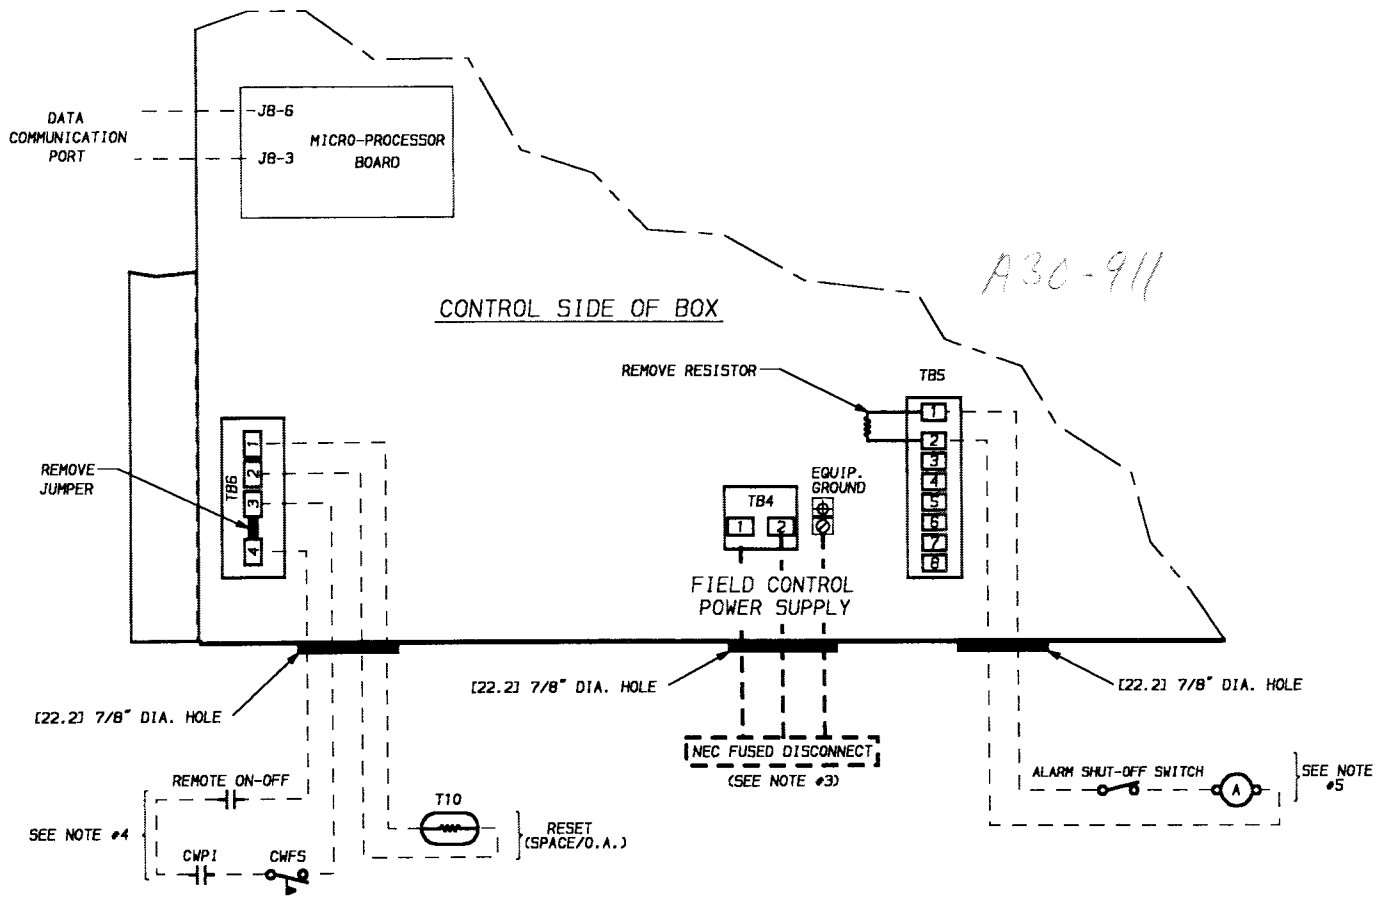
Field Control Power Wiring; Unit Sizes 080-110
